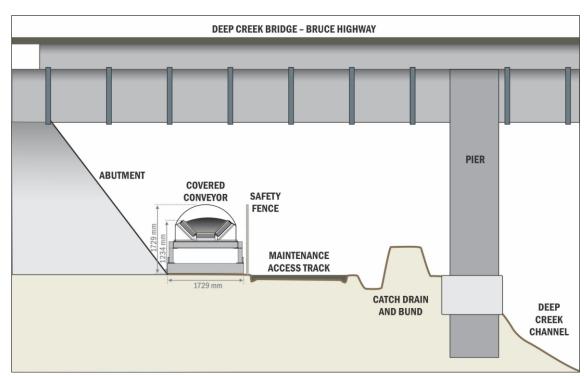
Conveyor crossing under Deep Creek road bridge
